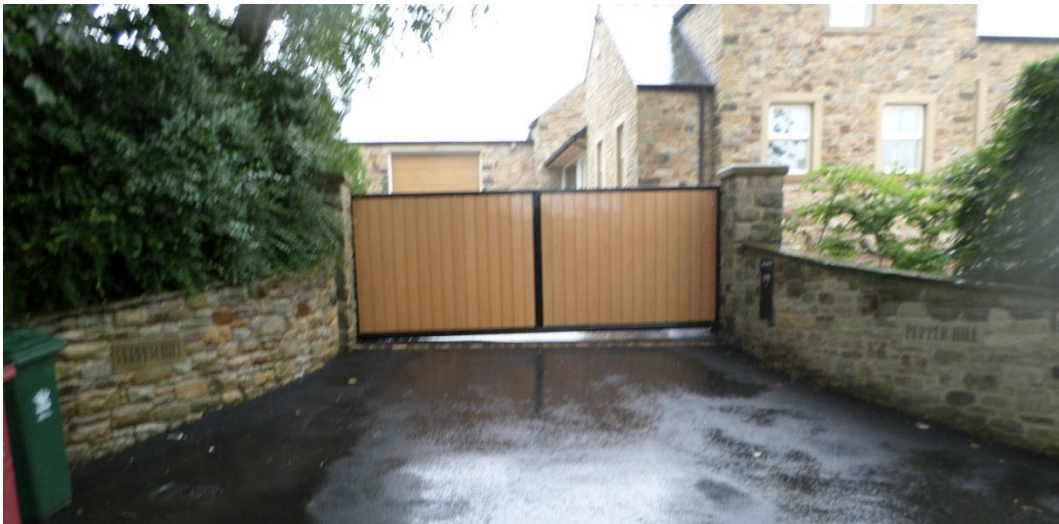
walling and entrance gates to Lynwood on Pendleton Road
